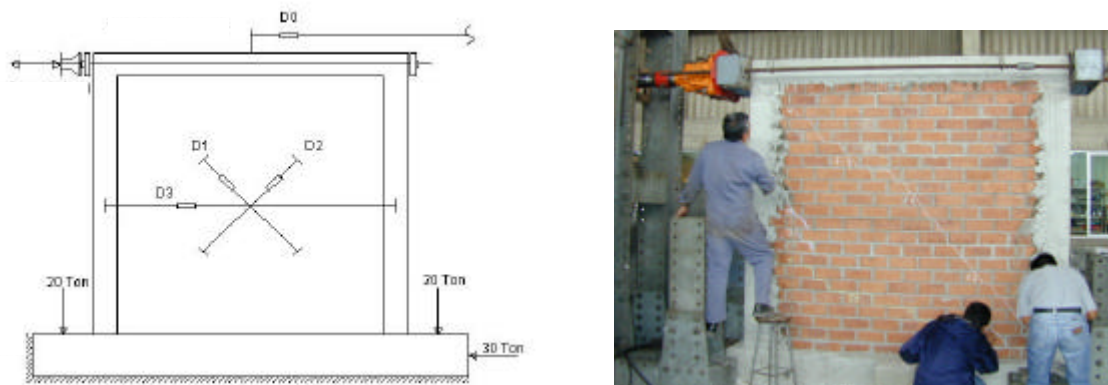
Lateral Load Test for Original Wall W1: Instrumentation and Overall View
